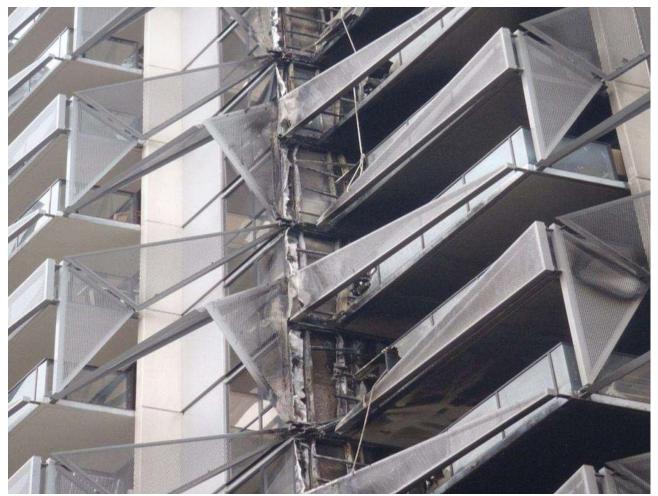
Fire damage to the external wall cladding and ornamental structures
